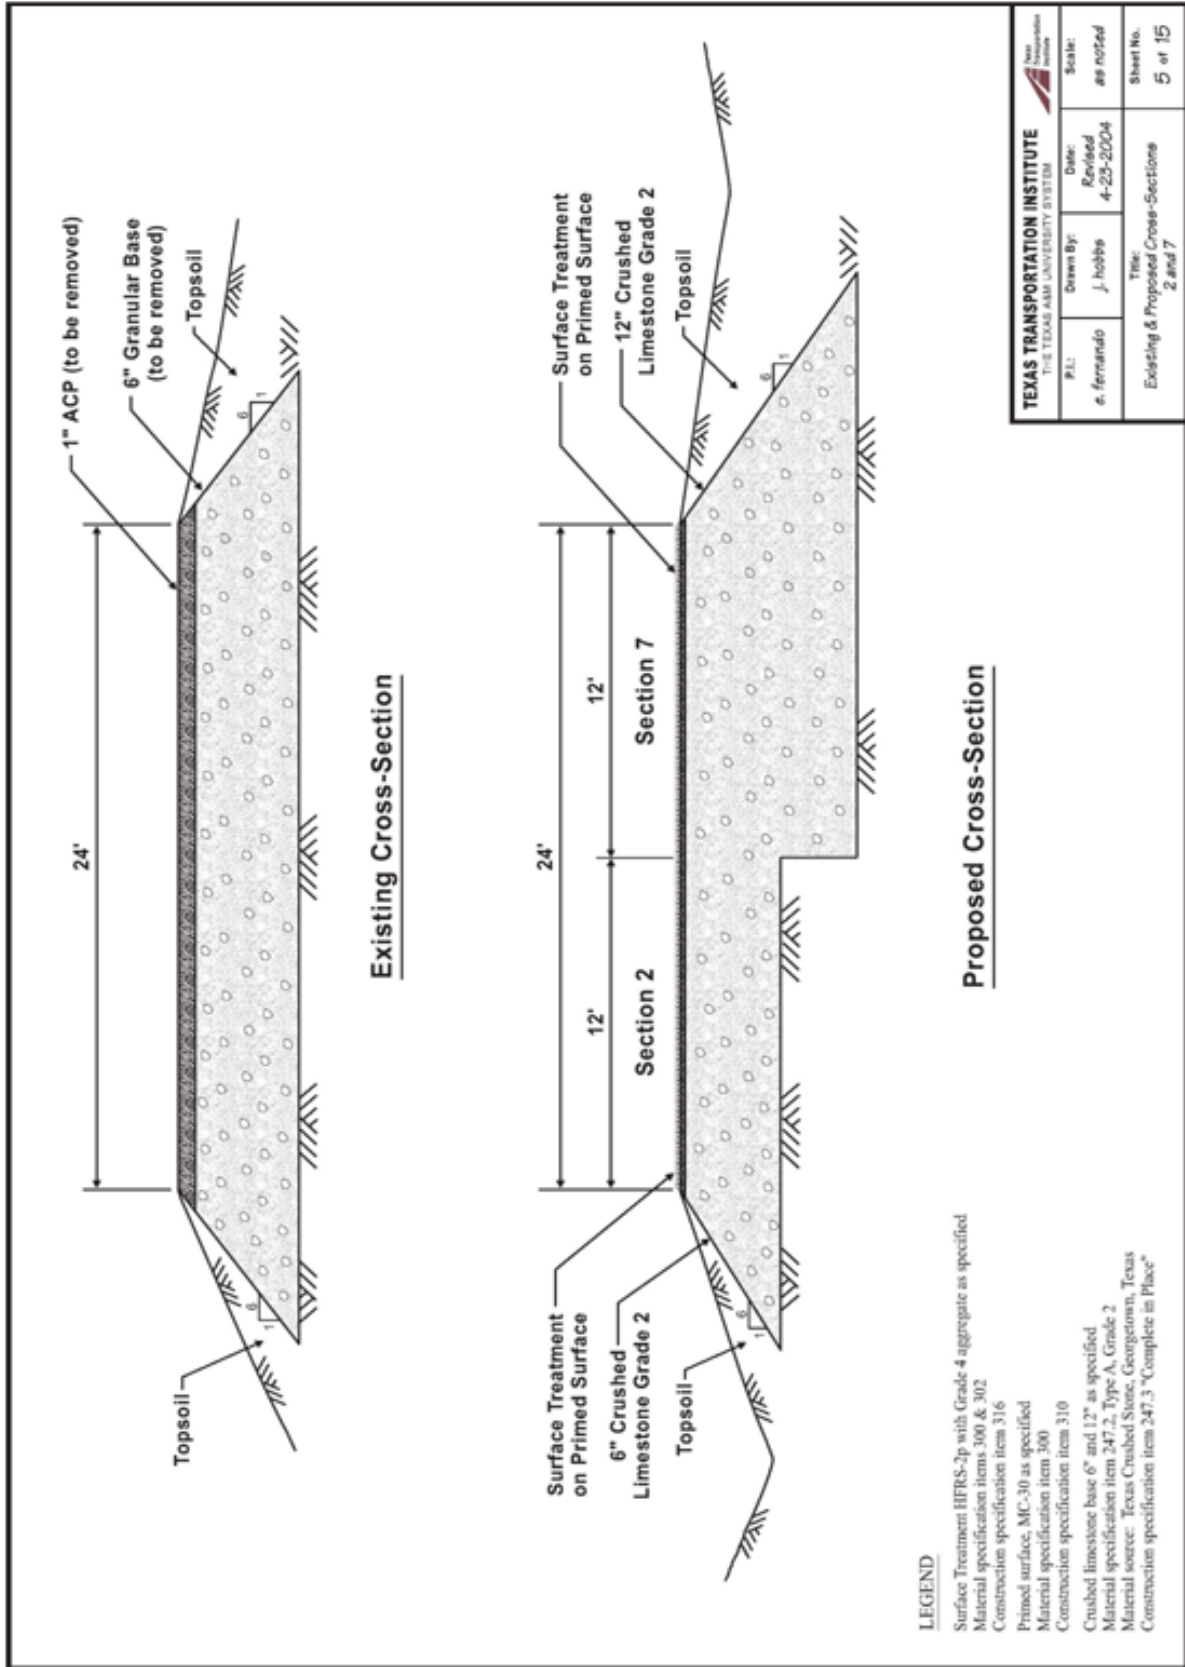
Existing and Proposed Cross-Sections for Sections 2 and 7.
